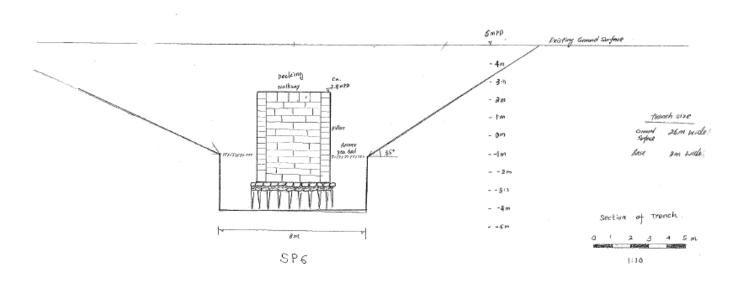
Reconstruction of Side view of Supporting Pillar SP6 of Longjin Bridge
